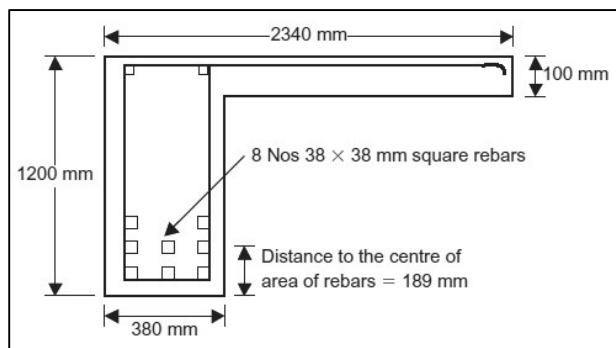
Cross-sectional details of the edge beam of Rocky Point Viaduct considered in the case-study
